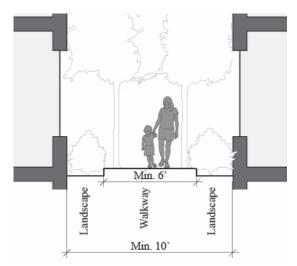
At least 10' wide open space with a minimum of 6' wide walkway.
